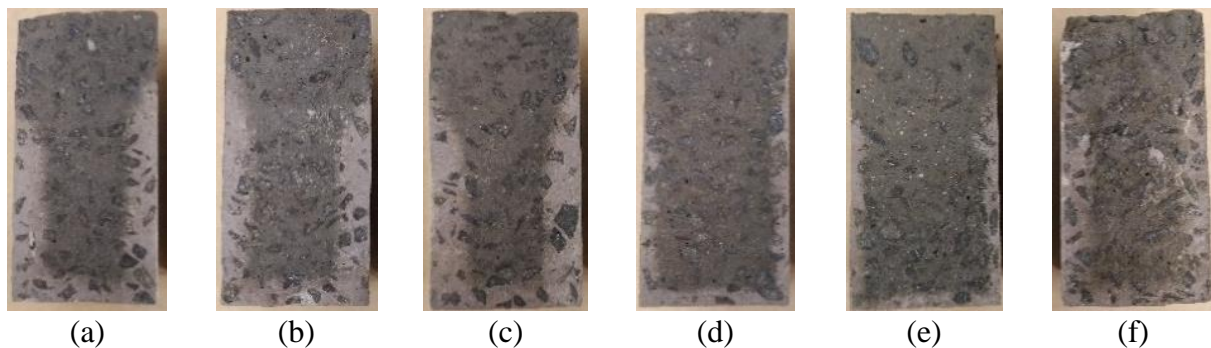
Fractured specimens after colorimetric test - 16 weeks:
